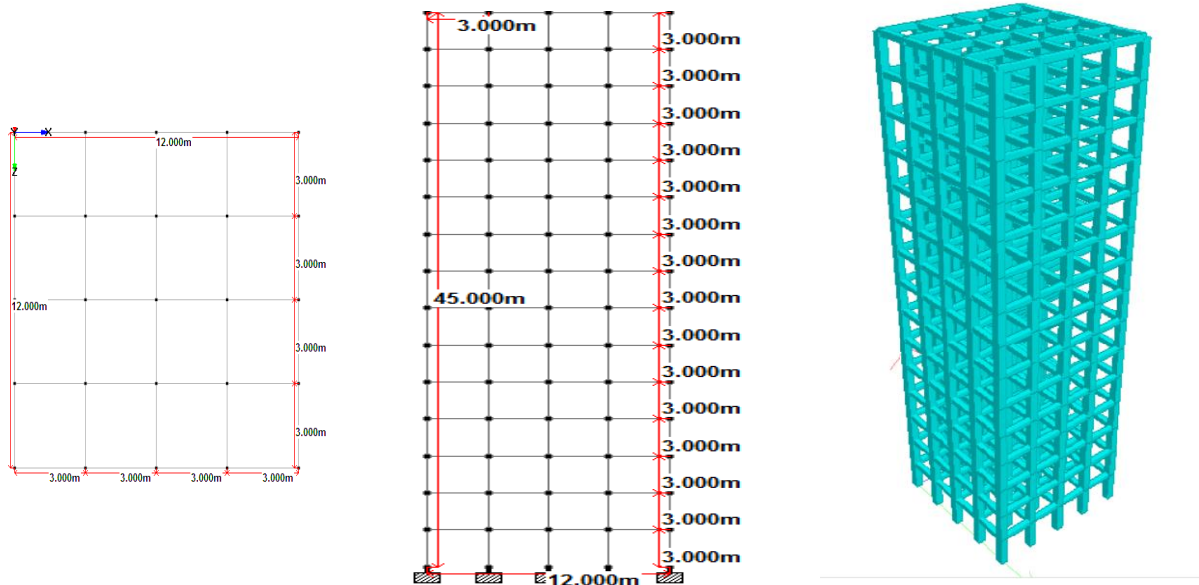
Structural Plan, Elevation and 3D Rendered view (BF) of RC Frame Model
